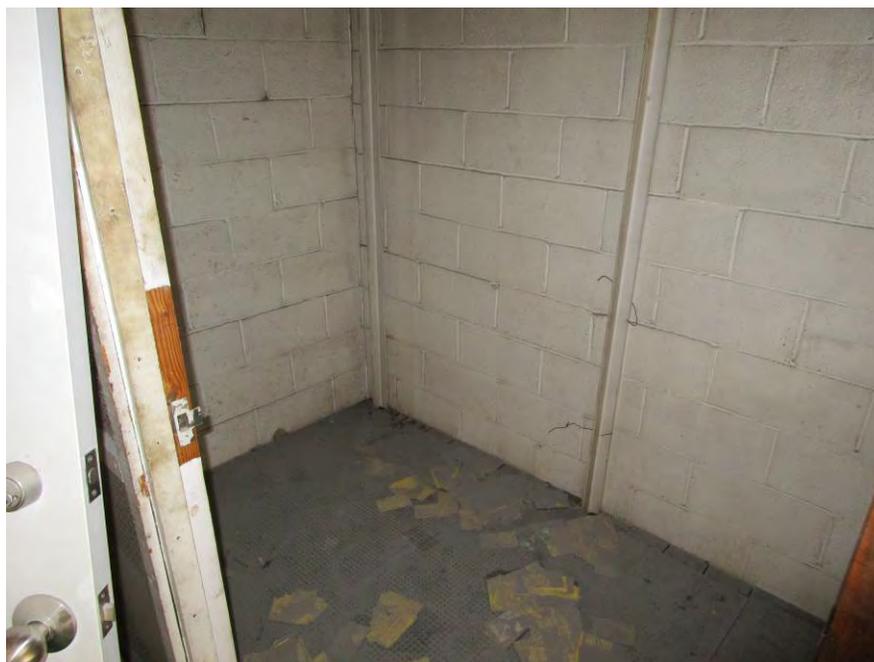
View of the cutting area inside the bar stock storage/laydown building.
